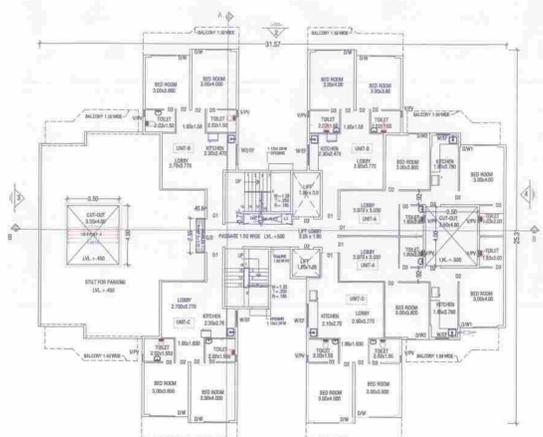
DETAIL OF TYPICAL FLOOR COVD. AREA - (1st. To 14)
